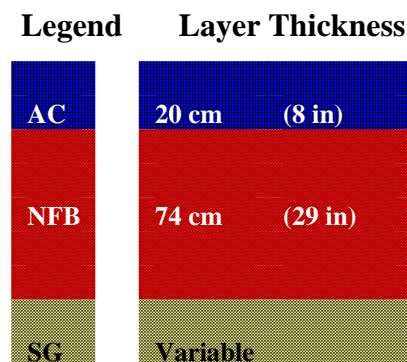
Pavement Structure Layers Used in Backcalculated Modulus.
